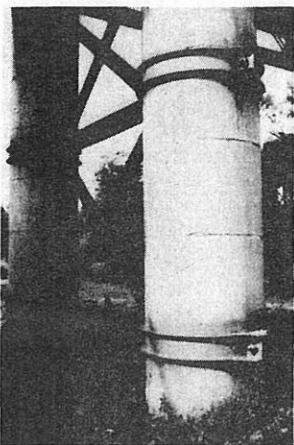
Monier pipes with in-fill concrete were used as piers for road bridges at many locations in New South Wales.
